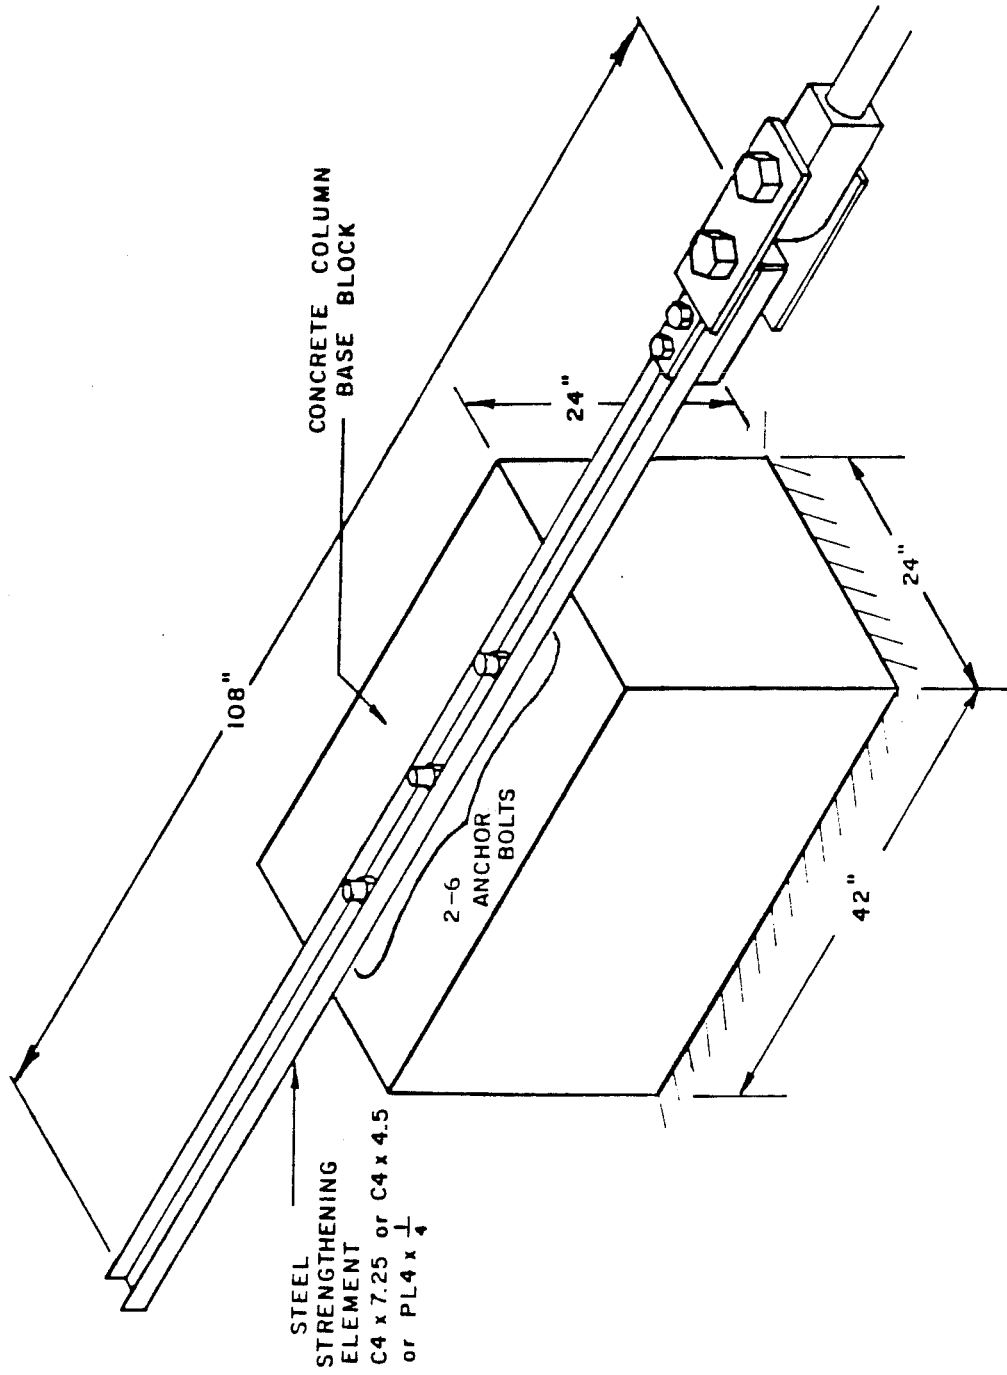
Test configuration from previous research on steel to concrete connections using adhesives [30]
